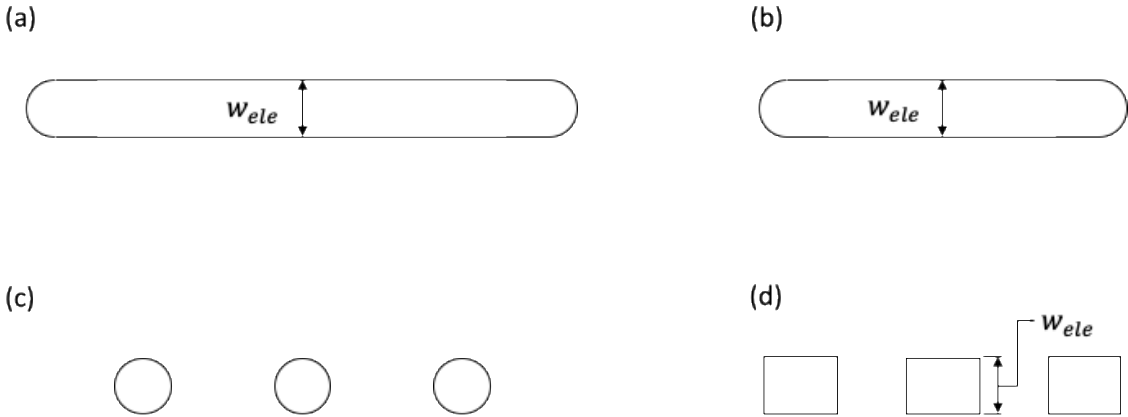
Cross-section at Base Showing Element Width Identified for (a) Walls, (b) Hammerhead Walls, (c) Circular Frame Bents, and (d) Rectangular Frame Bents
